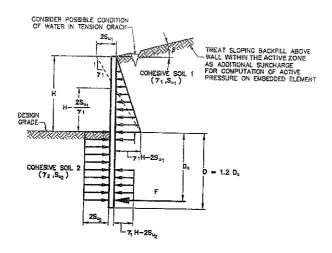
Unfactored Simplified Earth Pressure Distributions for Temporary Nongravity Cantilevered Walls with Continuous Vertical Wall Elements Embedded in Cohesive Soil and Retaining Cohesive Soil Modified After Teng (1962).
